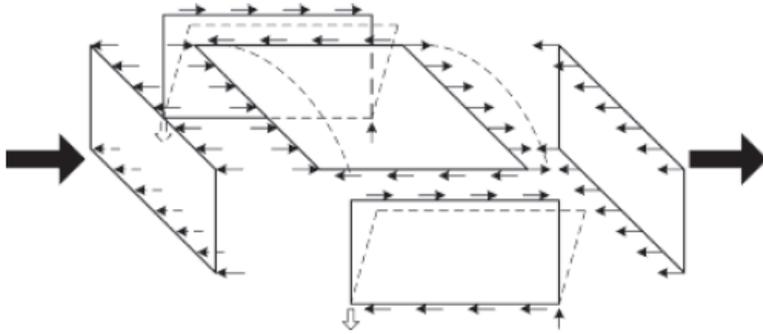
Transfer of horizontal loads via the slab to the wall sheeting. (Källsner & Girhammar 2008)
